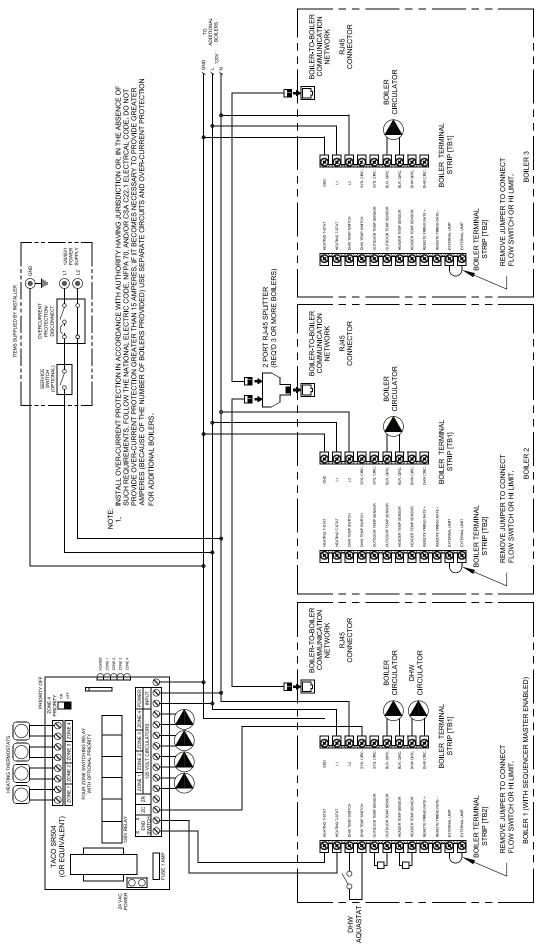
A: Multiple Boiler Wiring Diagram Internal R7910 Multiple Boiler Control Sequencer (Three Boilers Shown, Typical Connections for up to Eight Boilers)
